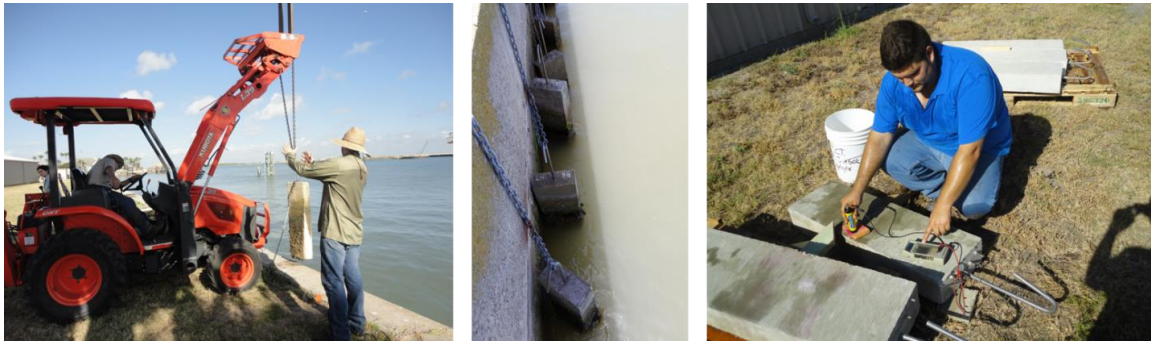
Lowering blocks (left), hanging blocks (middle), measuring blocks (right)
